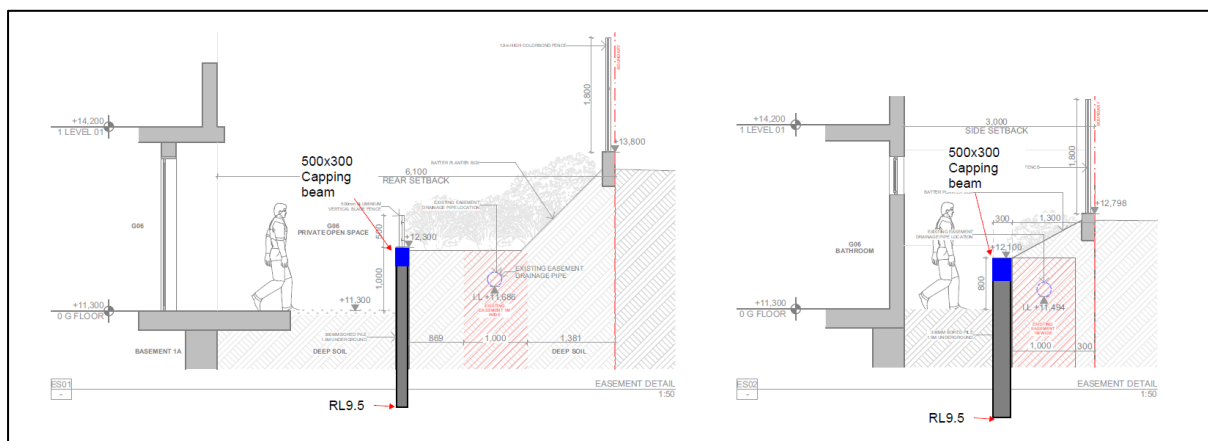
Sections of the rear (left) and southern side (right) showing actual location of stormwater pipe below the surface level
